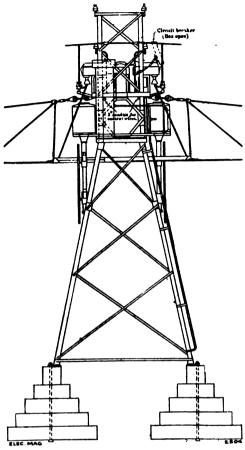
END ELEVATION OF ANCHOR BRIDGE.
